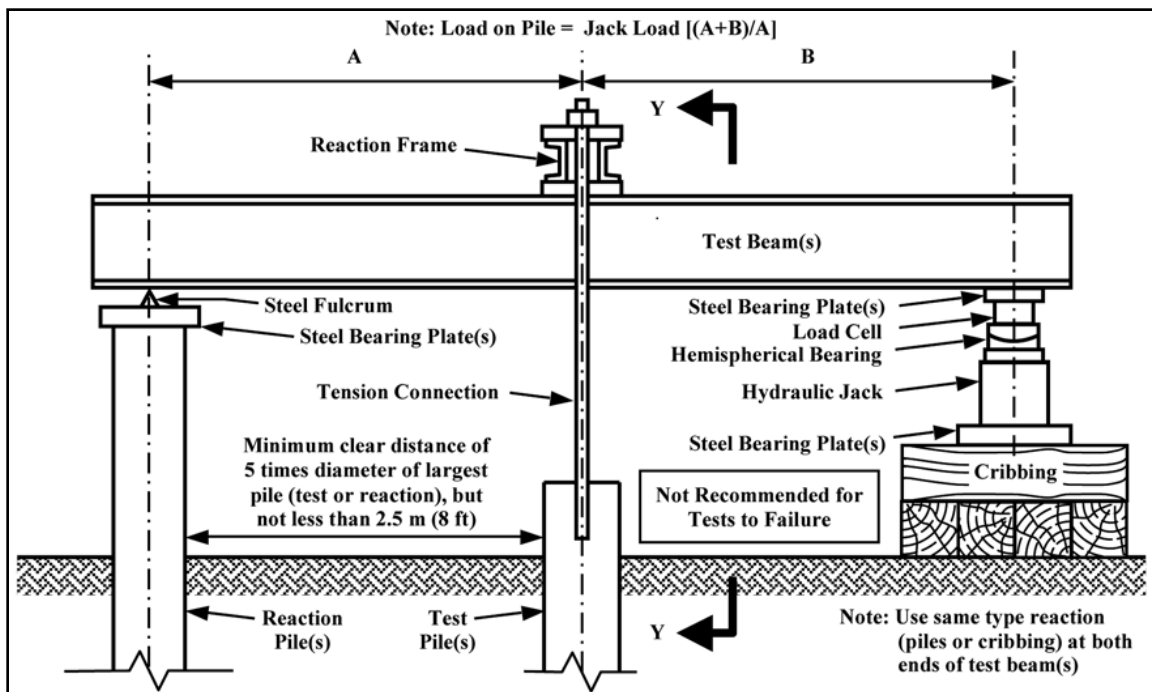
Typical setup for tensile load test using hydraulic jack(s) acting upward on one end of test beam(s) (ASTM D3689 – 07).
